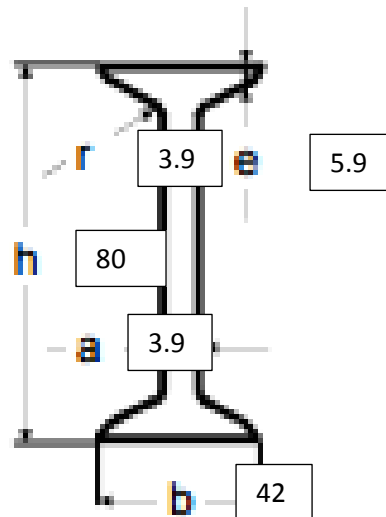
"I" shaped beam dimensions. All dimensions are in mm
